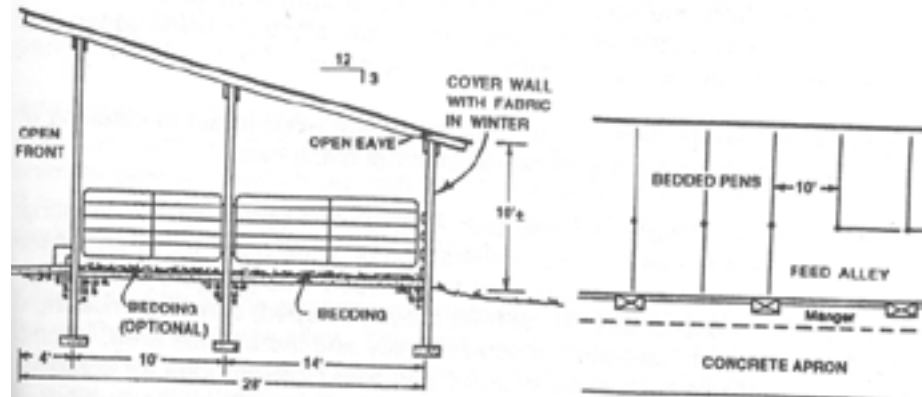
A super calf hutch. Fabric may be substituted for plywood sidewall cladding, the fabric being removed in summer to provide ventilation.
